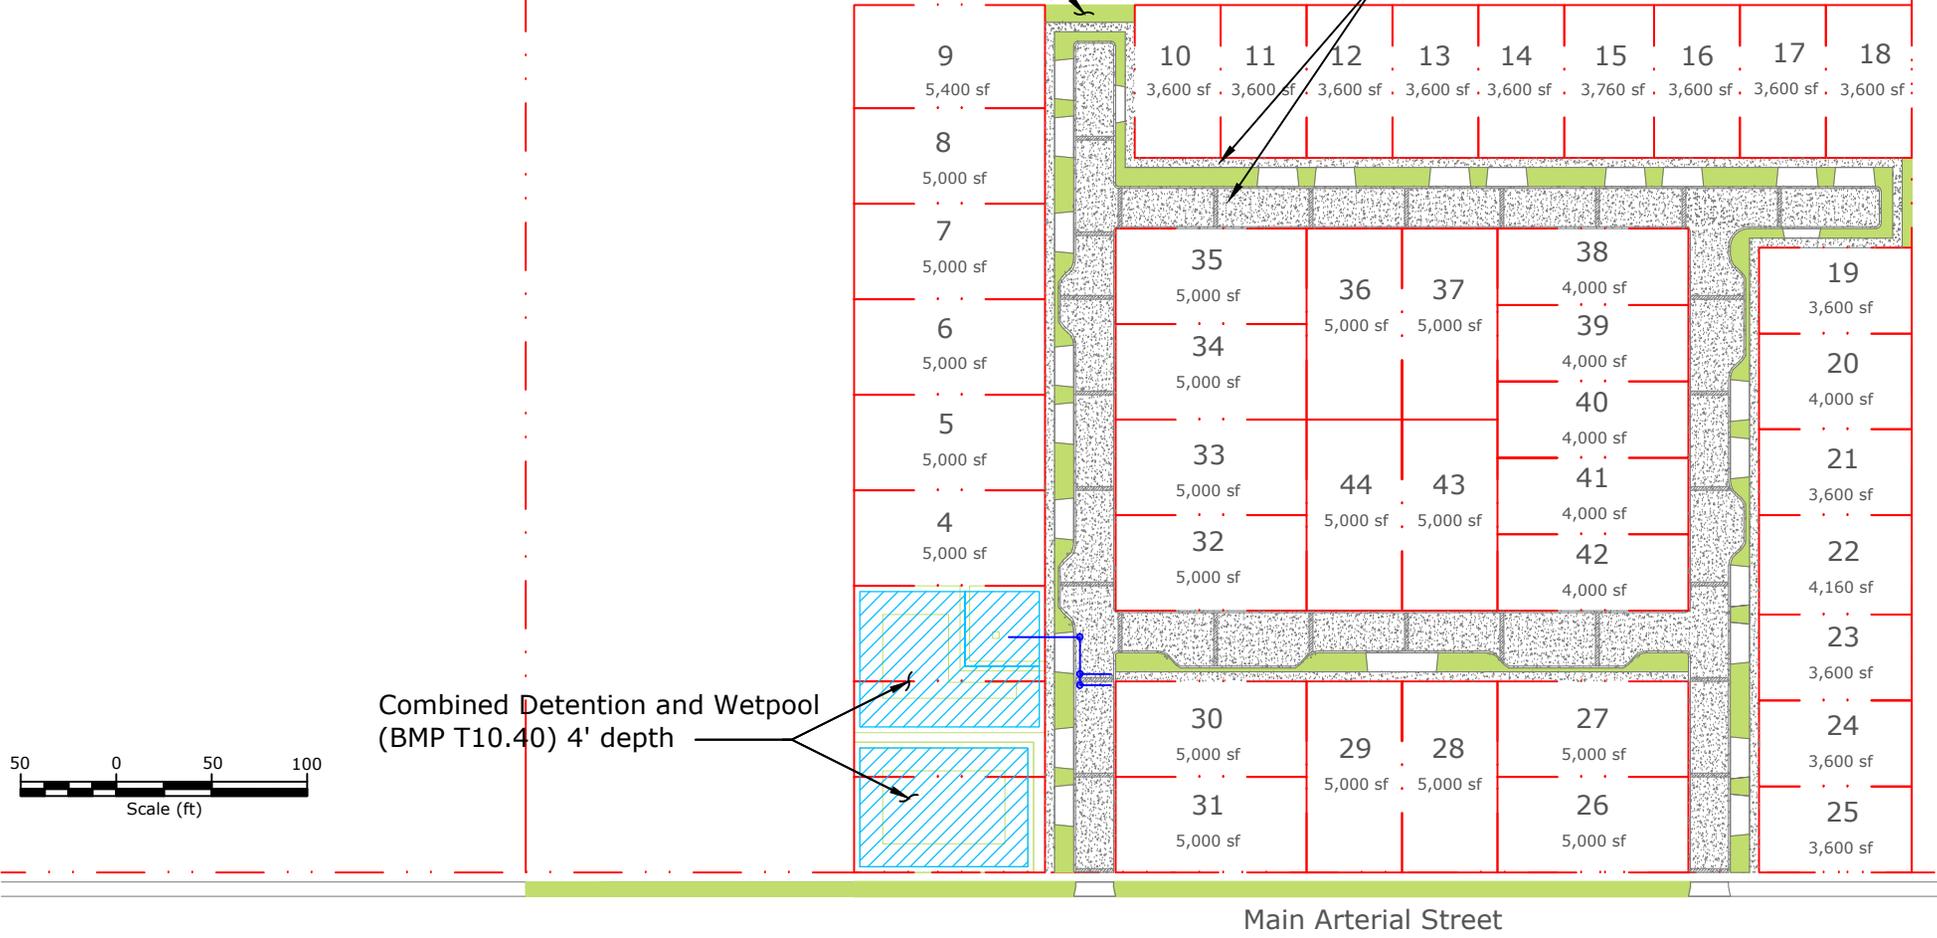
Scenario 6. Permanent Stormwater Site Plan - Typical Single-Family Residential Development, 2012 Requirements with LID Principles, Till Soils
